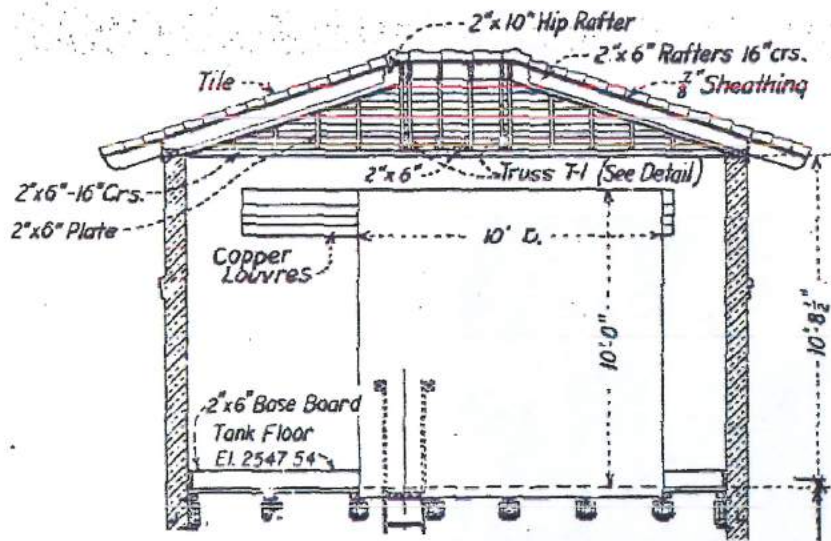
Section Showing Roof Framing Above Tank Floor Tower
